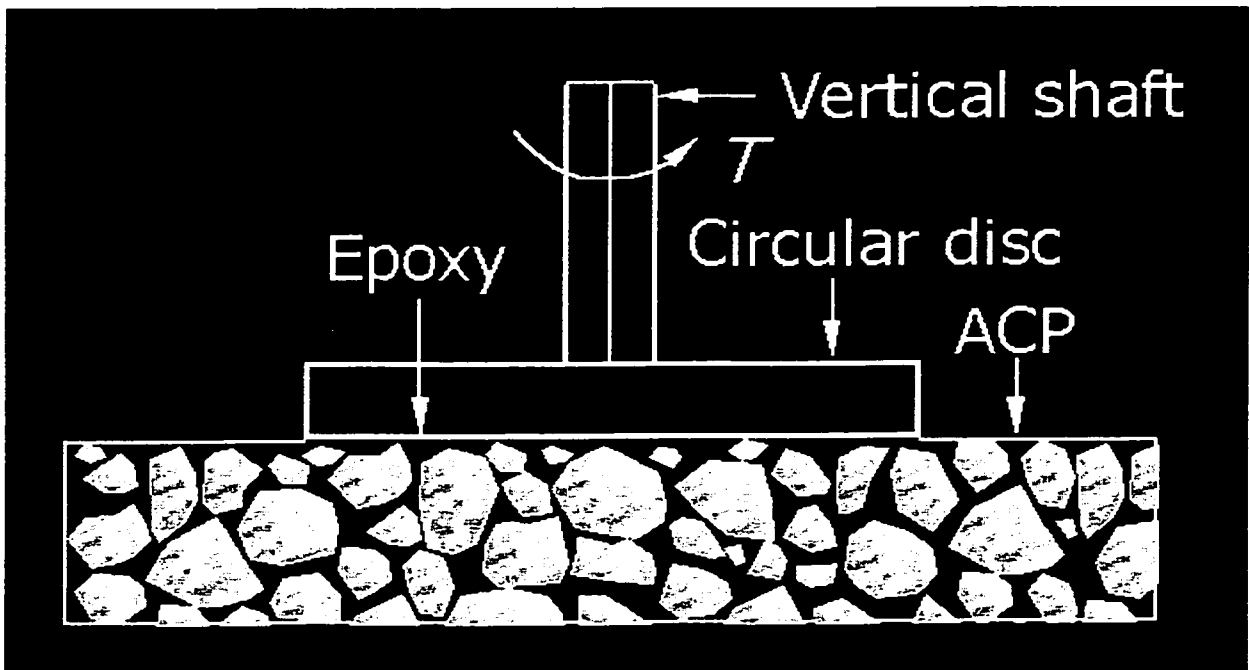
Load Plate Attached to Asphalt Concrete Pavement (ACP) Surface
